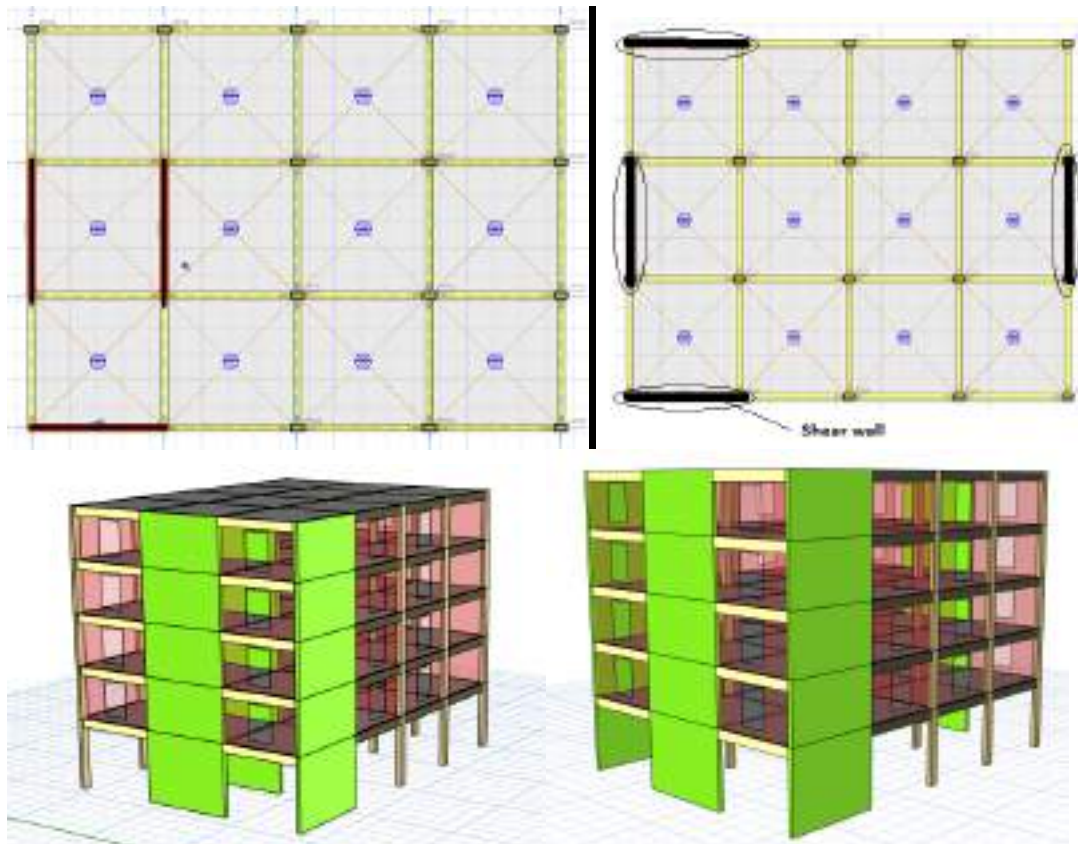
Position Unsymmetric and Symmetric of Shear Wall on the Structure
